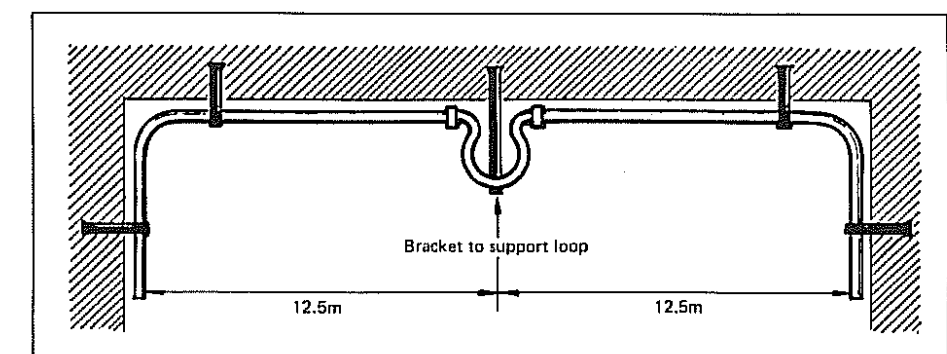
Method of fixing long lengths of pipework along a wall (Loop expansion joint)
